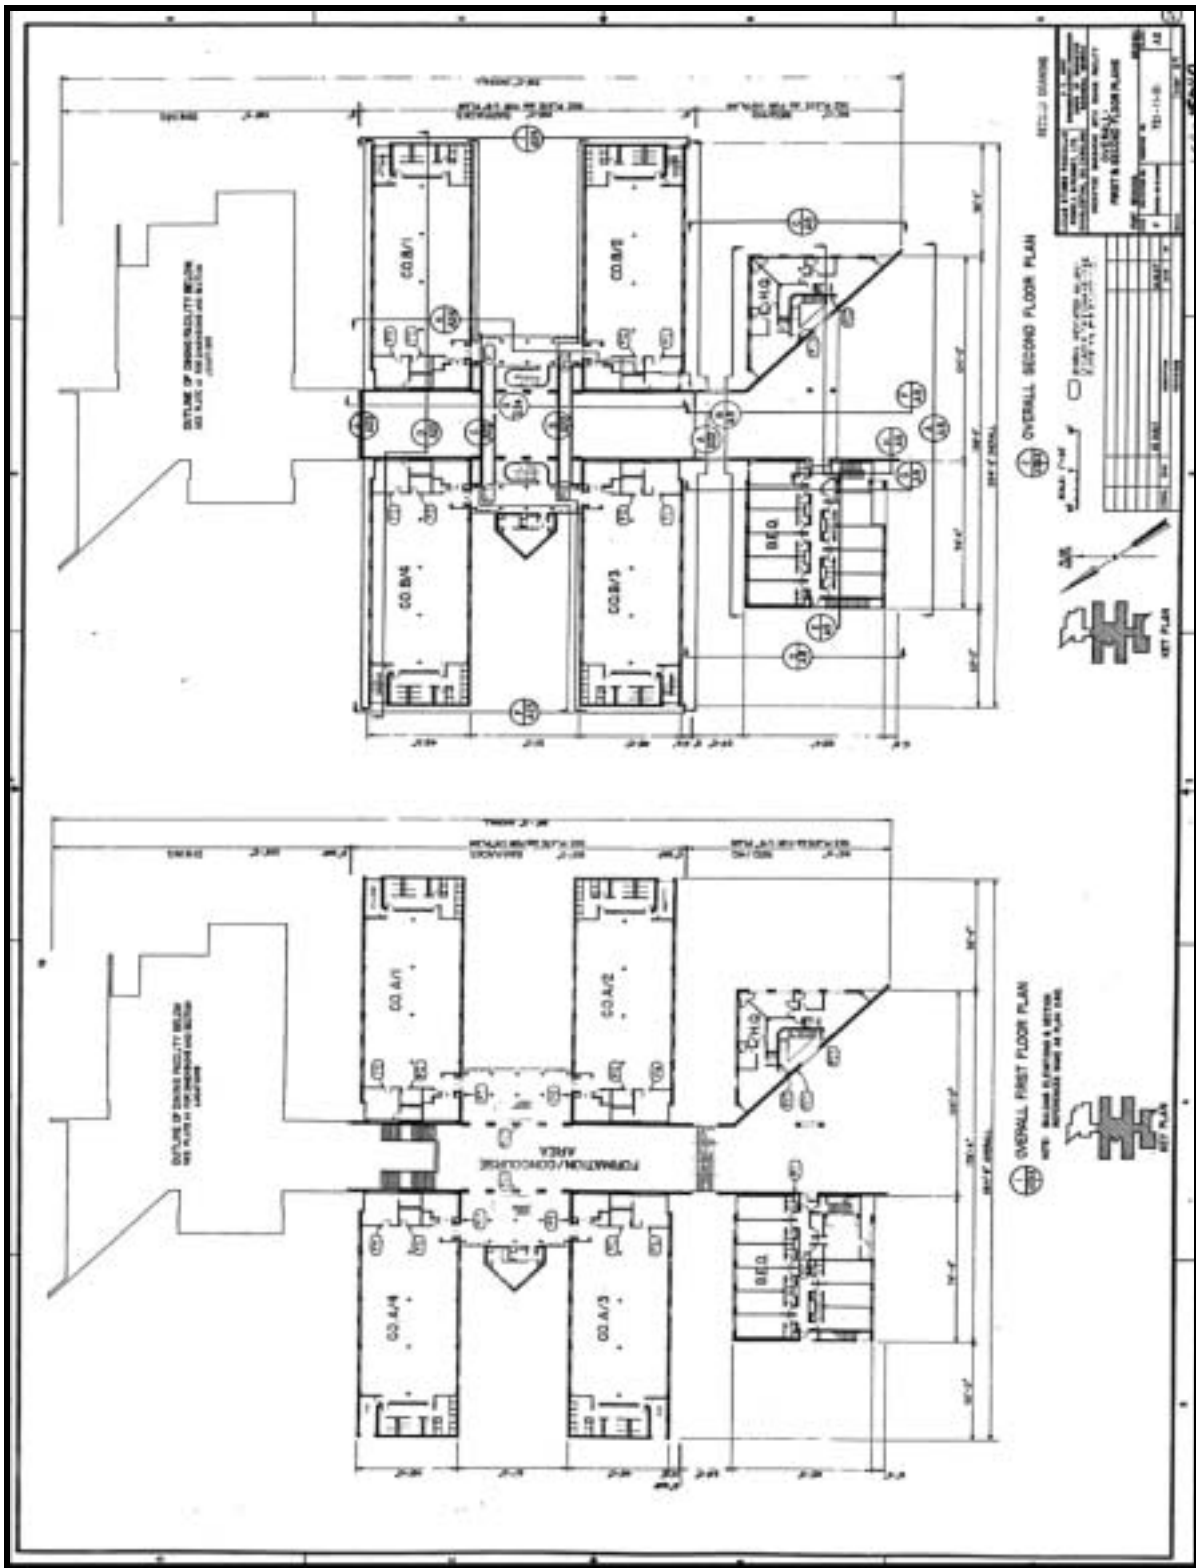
Receptee barracks, first and second floors (1985, revised 1987) (Engineering, Ft. Benning).
